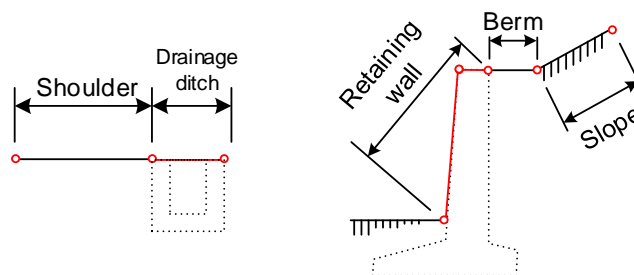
How to create "Surface" of a structure (left: drainage ditch, right: retaining wall)
